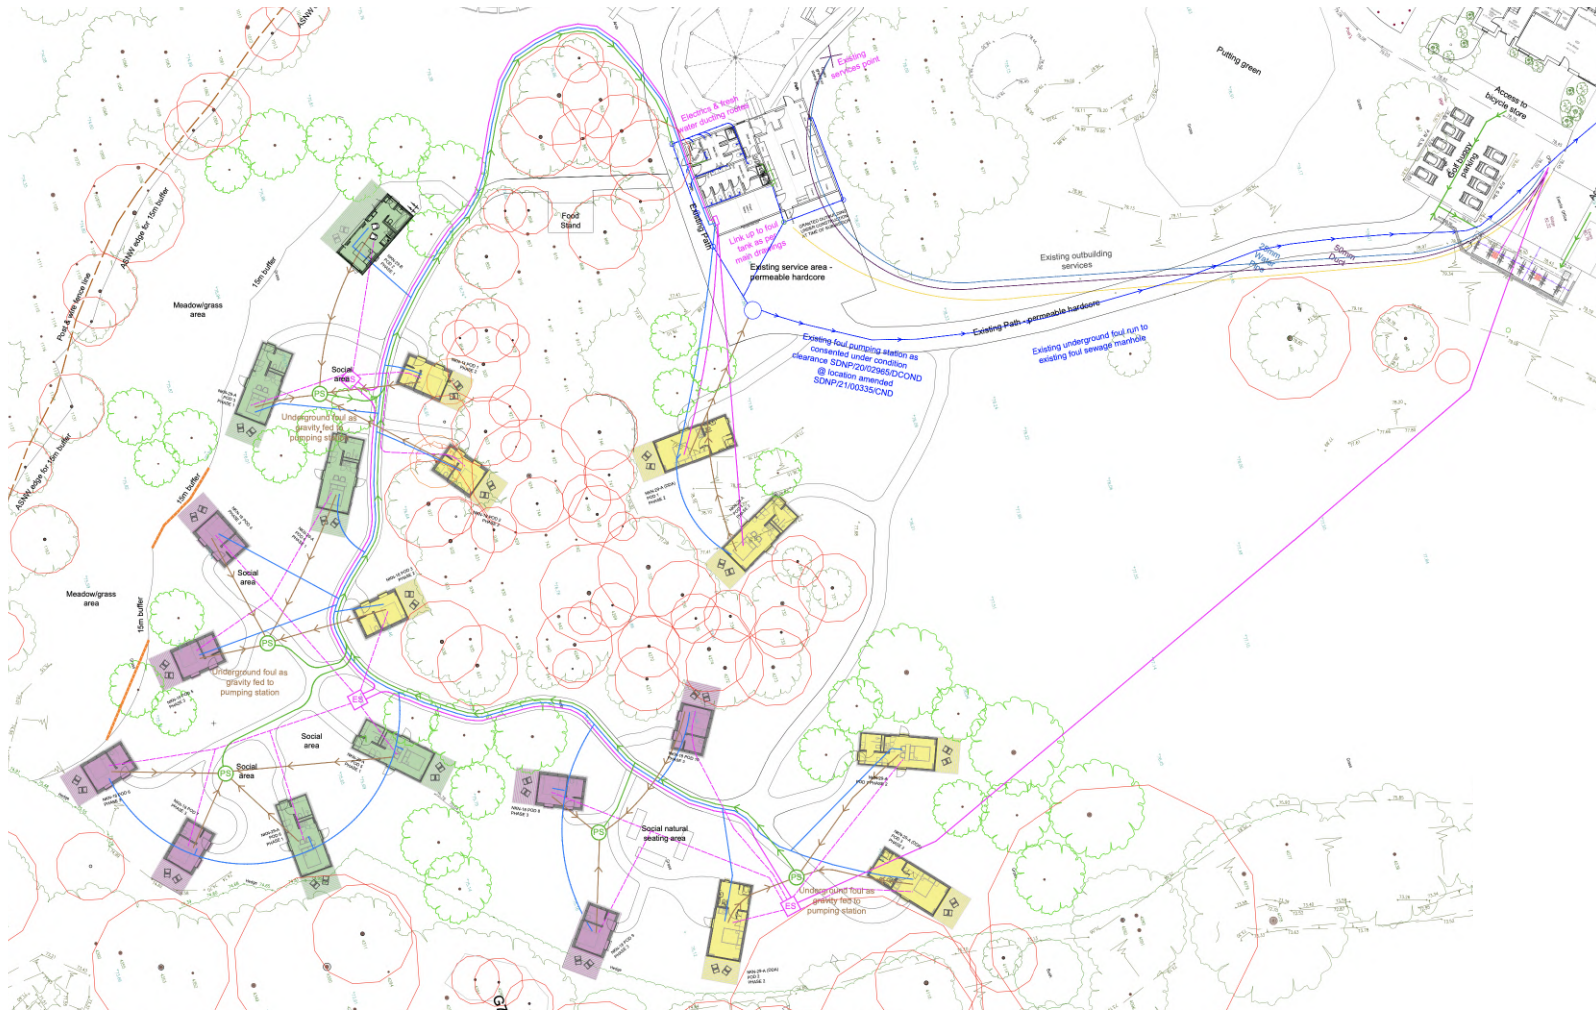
Site plan showing proposed and existing foul sewerage and utilities runs (NTS)
